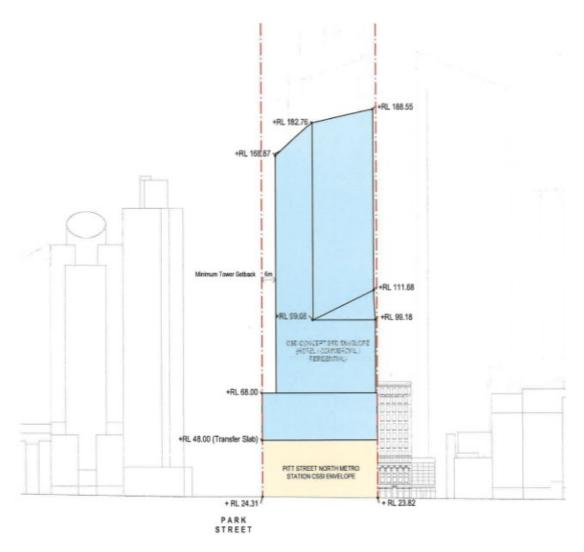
Pitt Street North Concept SSD DA – Envelope – East Elevation
